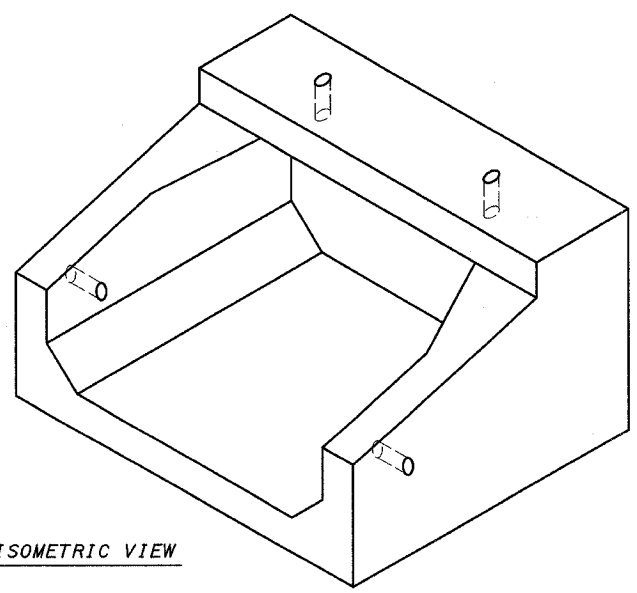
DETAIL OF PRECAST CONCRETE BOX CULVERT END SECTION
